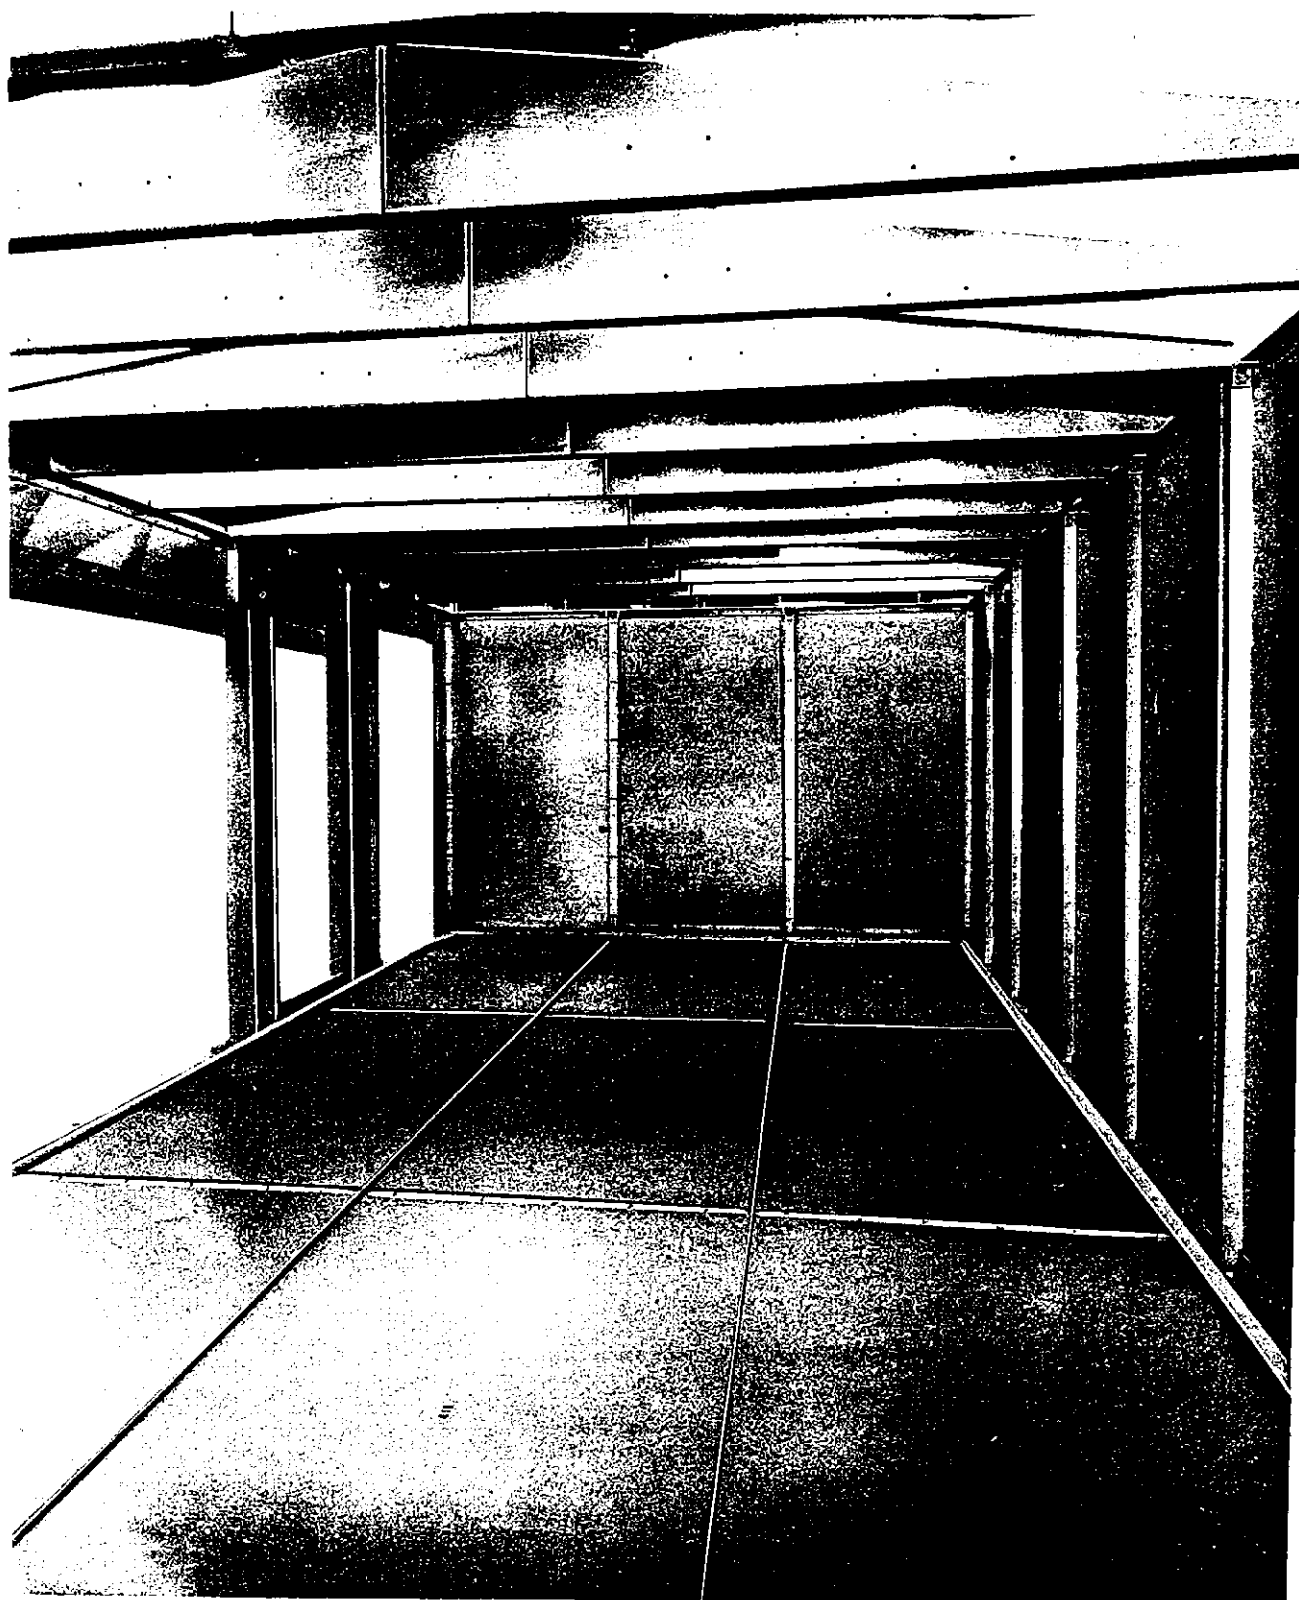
Enclosure, Inside View Including Floor Pan Assembly
